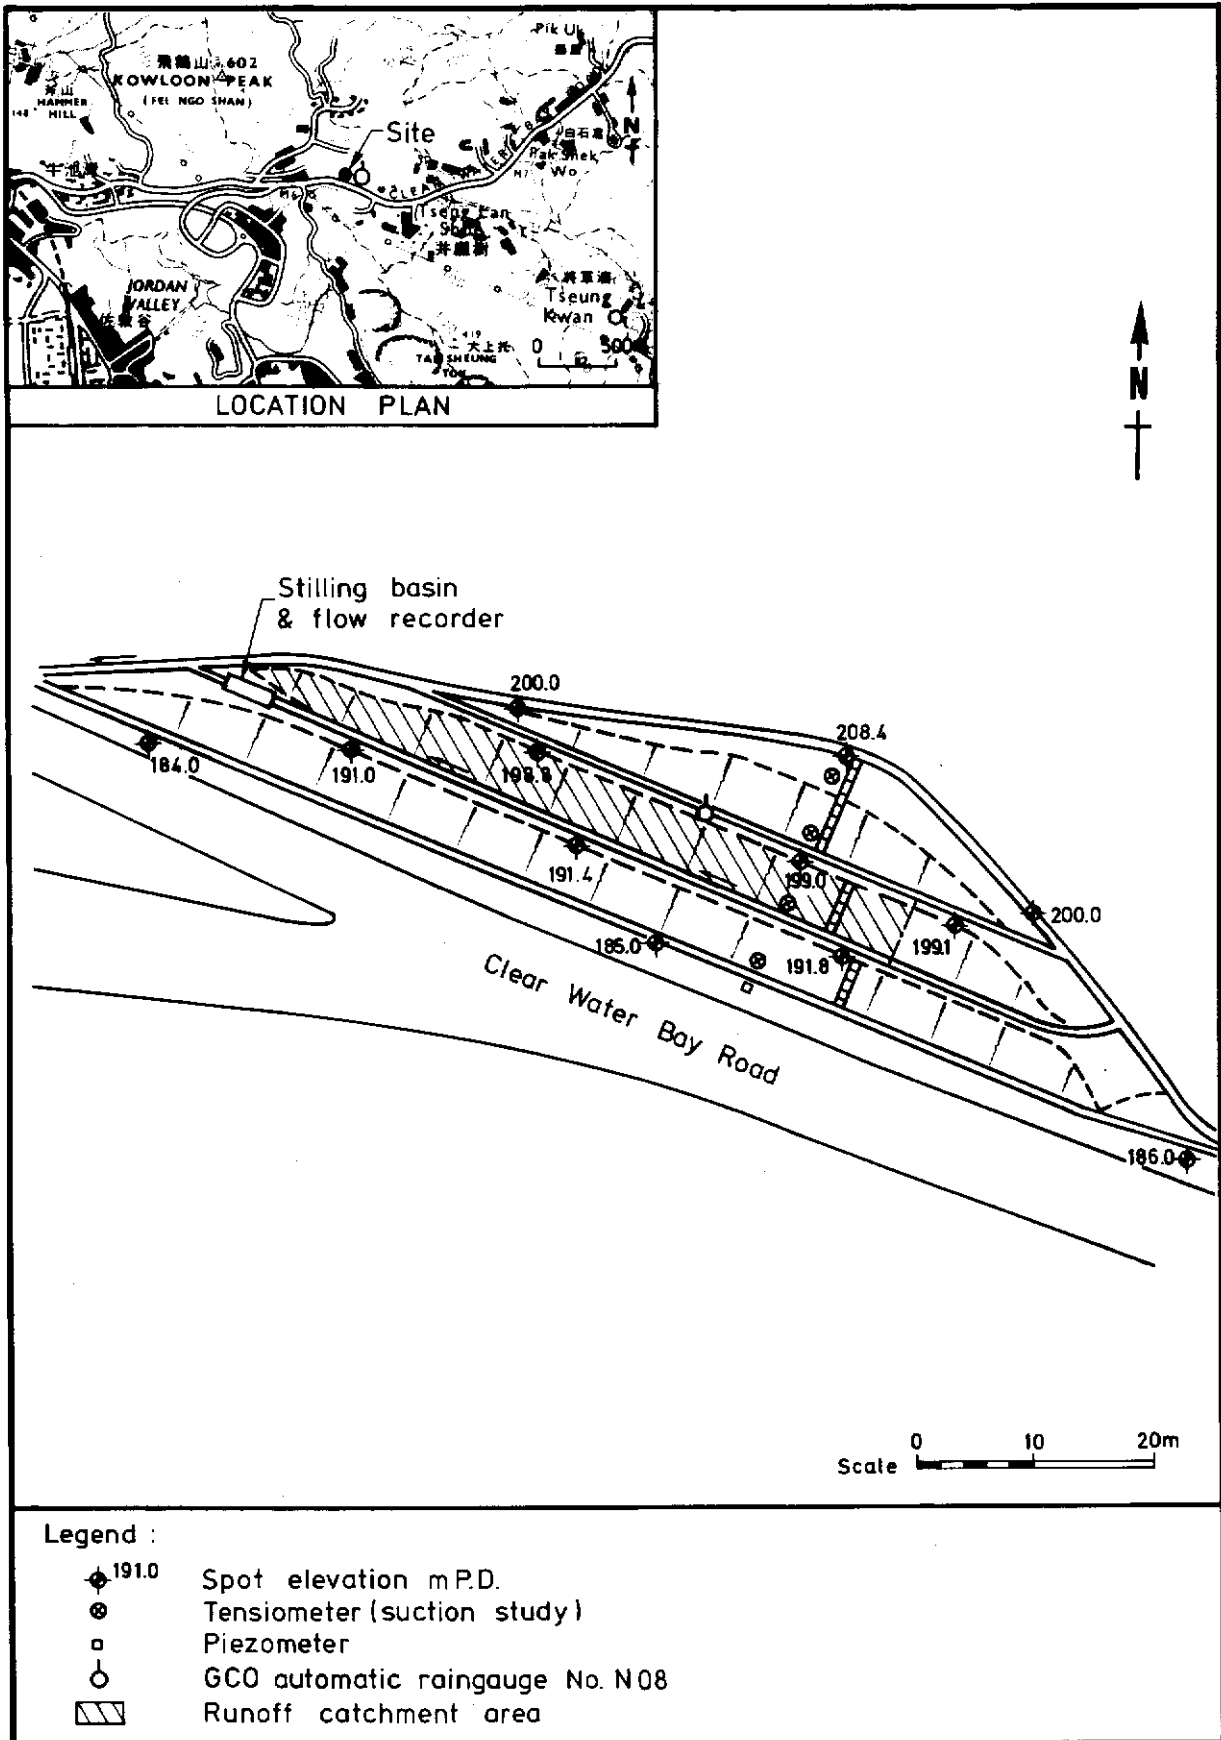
Site Plan for the Runoff Plot at Clear Water Bay Road (CWA)
